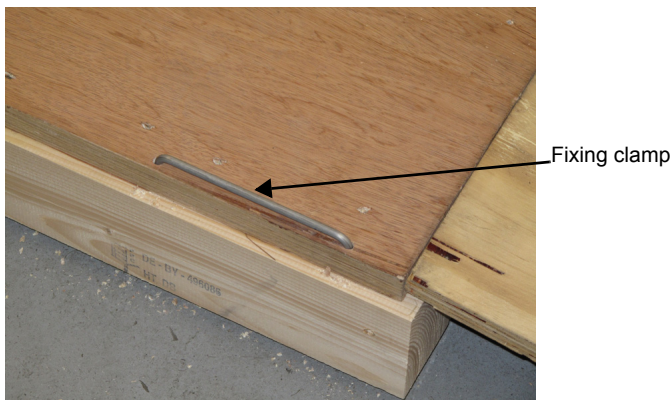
Fixing clamp hooked up in the drill holes on the pallet
